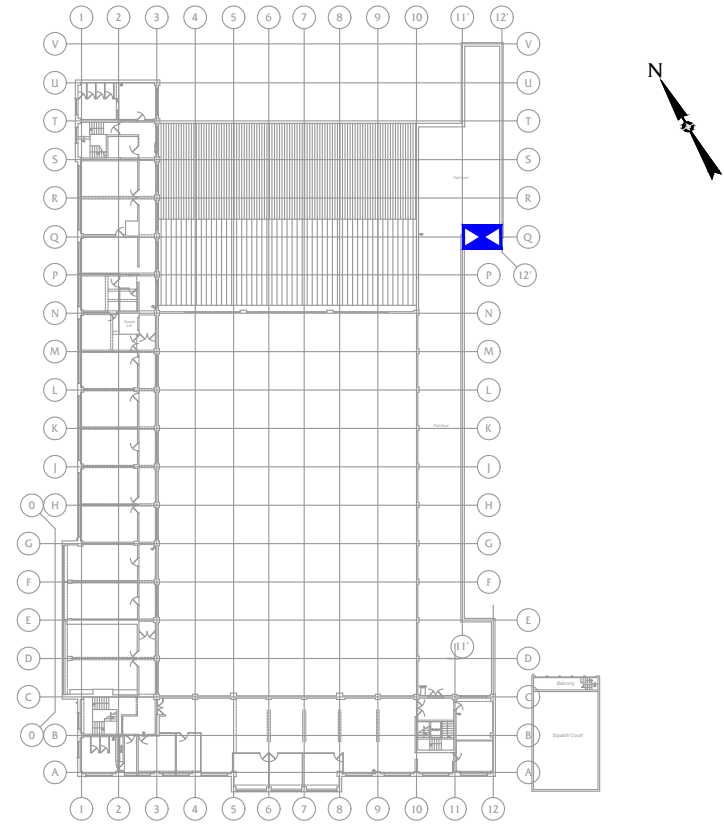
PART REFLECTED 1ST FLOOR SLAB SOFFIT PLAN SHOWING DETAILS OF BEAM AND PRECAST CONCRETE PLANK - SURVEY AREA Q/11-12 SCALE 1:10
